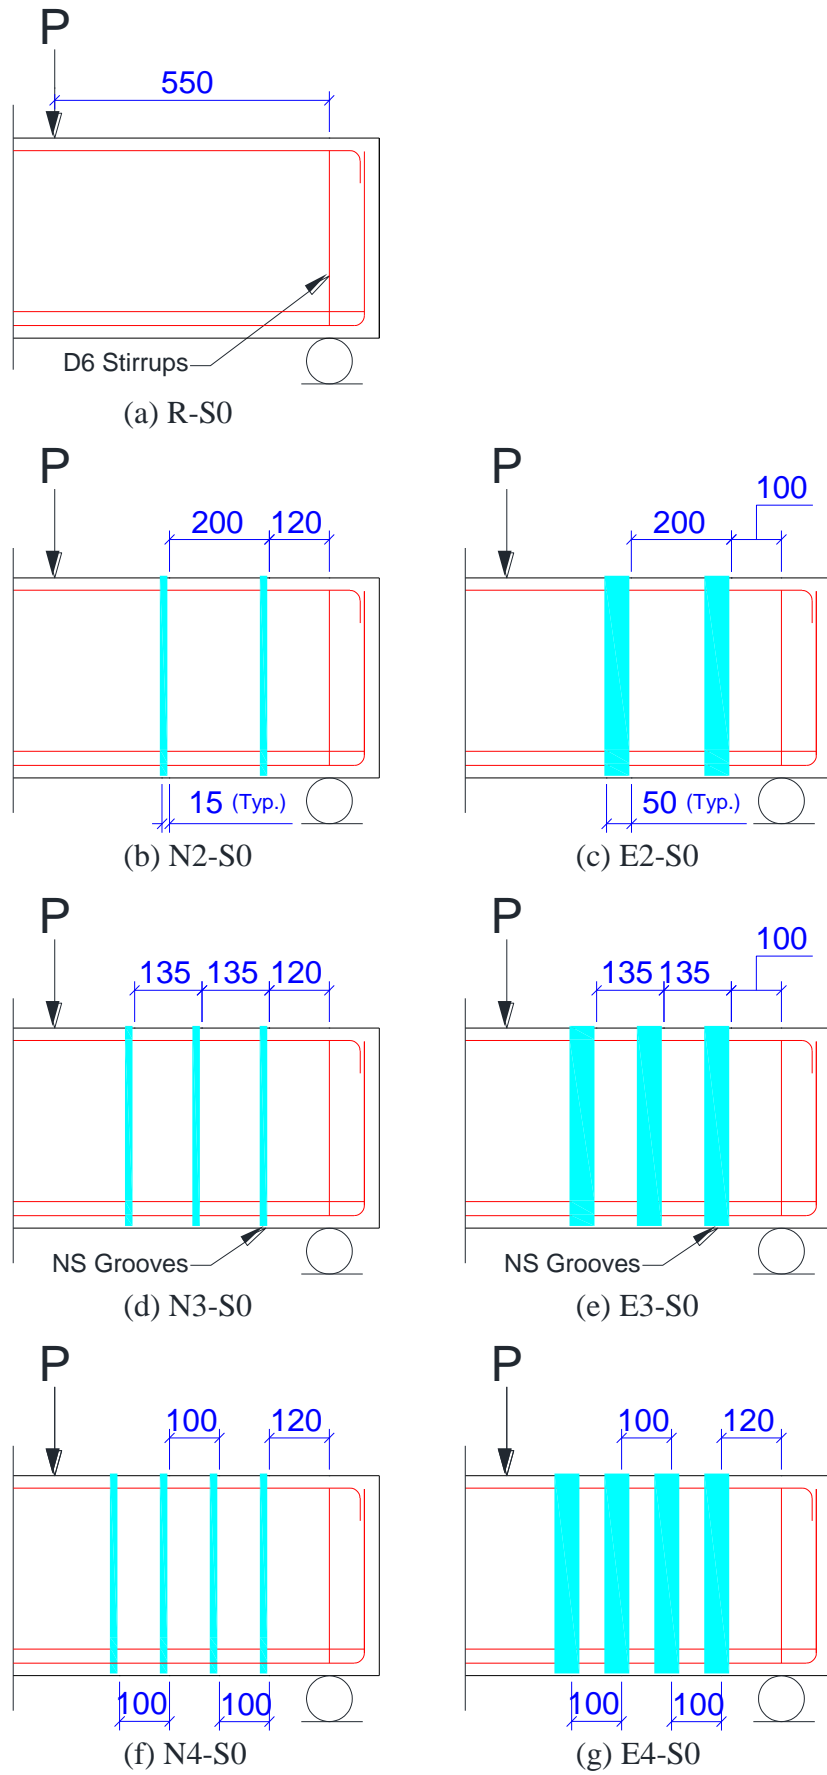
Group 1- Beam specimens with no stirrups at the CSS (Dimensions in mm).
